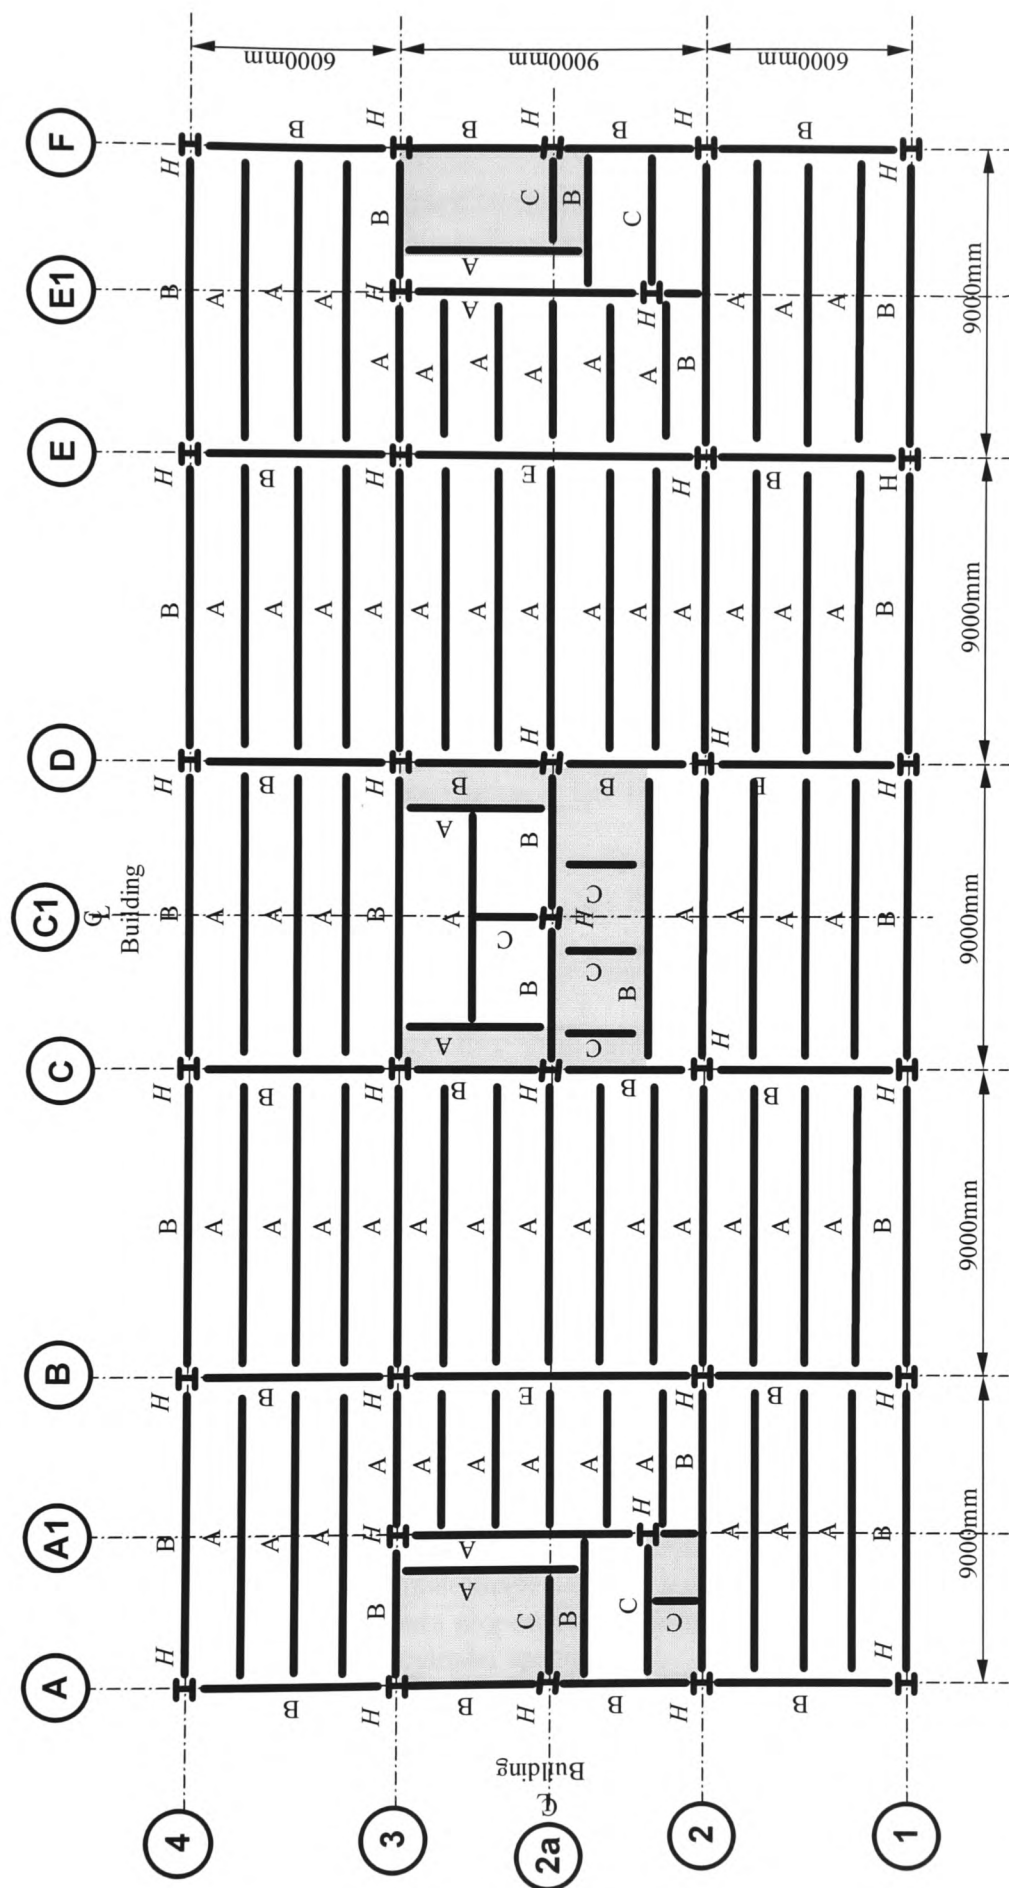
Plan on the 8th floor showing the general layout of the main structural elements
